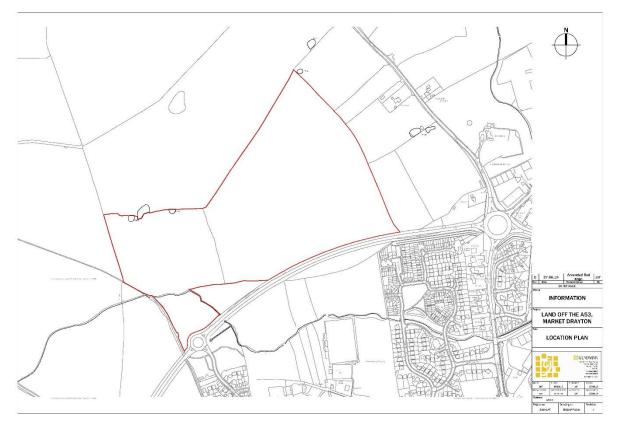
Land off the A53, Market Drayton – Site Location Plan
